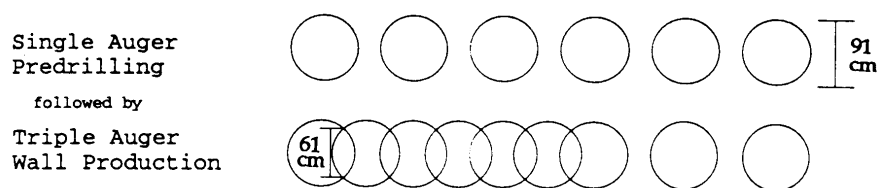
Lake Cushman spillway: Installation procedures for soilcrete wall
